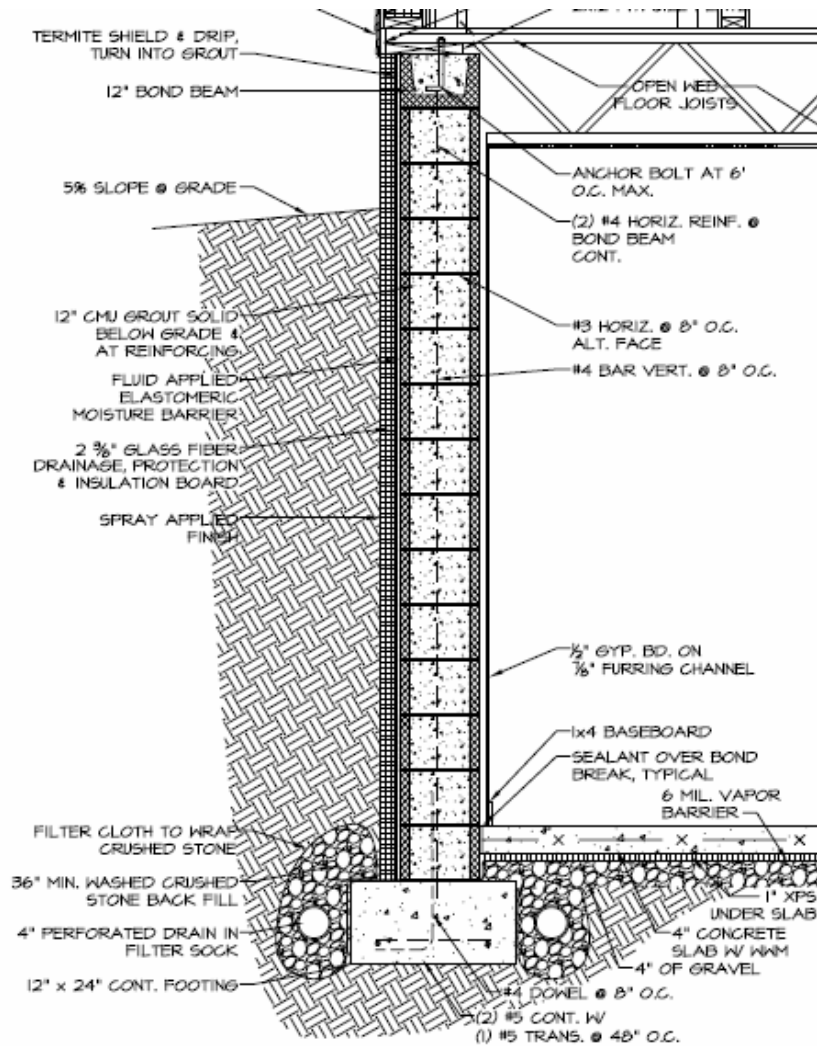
ZEH5 foundation detail, Eason Architects, 2007.
